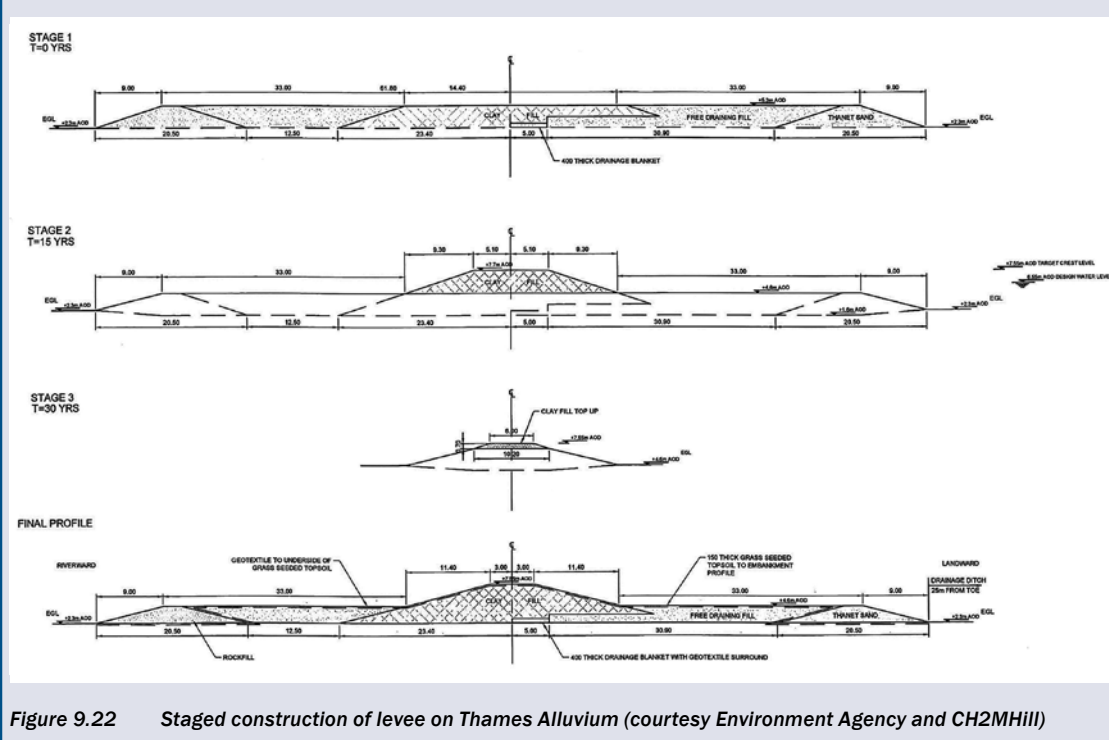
Staged construction of levee on Thames Alluvium (courtesy Environment Agency and CH2MHill)
